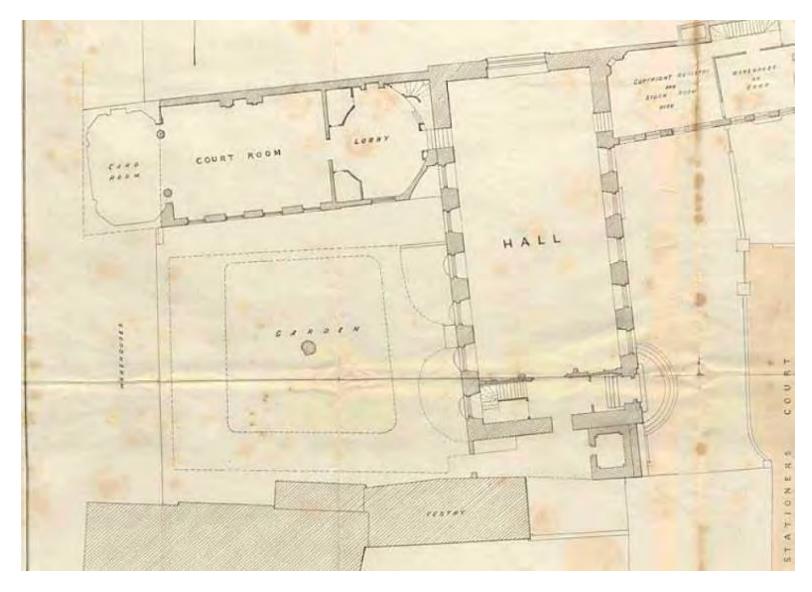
c.1870 Plans showing the layout of the Hall complex and Gardens. Note the layout appears to indicate a door to Hall undercroft which is no longer existing (TSC/1/G/06/04/01/51).
